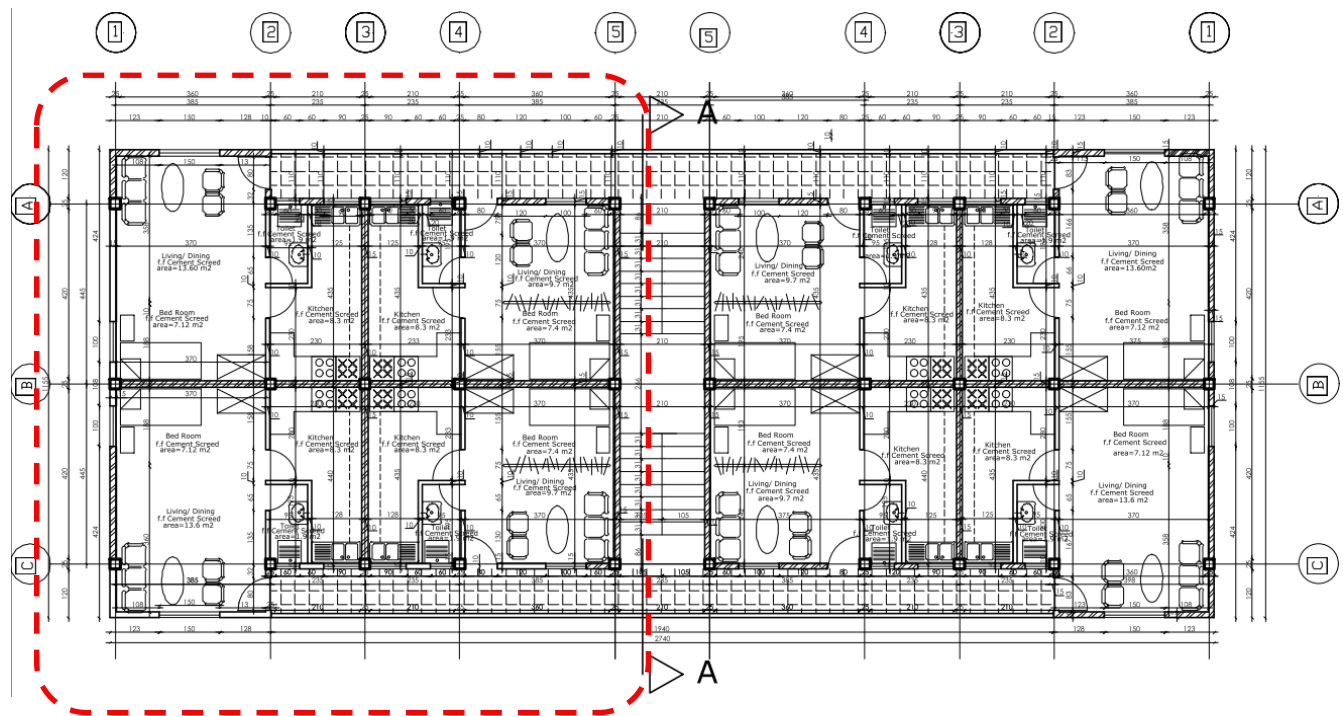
1st and 2nd floor plan of the building considered.
